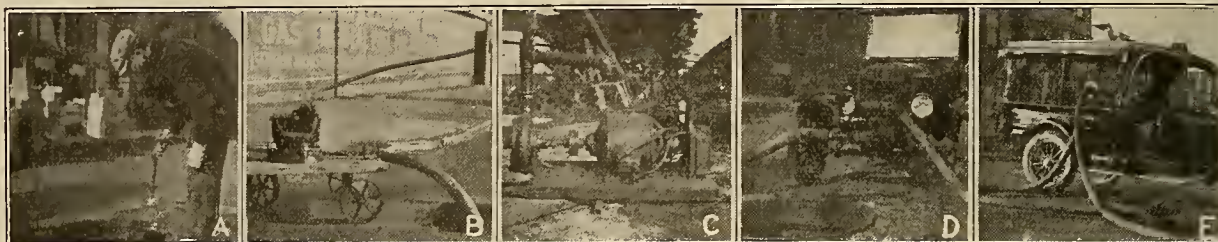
Evolution of manhole pumping: (a) old bucket-and-rope method; (b) hand pump; (c) portable electric motor-driven centrifugal pump; (d) centrifugal pump mounted on frame of car and driven by car engine; (e) gear pump in action, driven by car engine.
